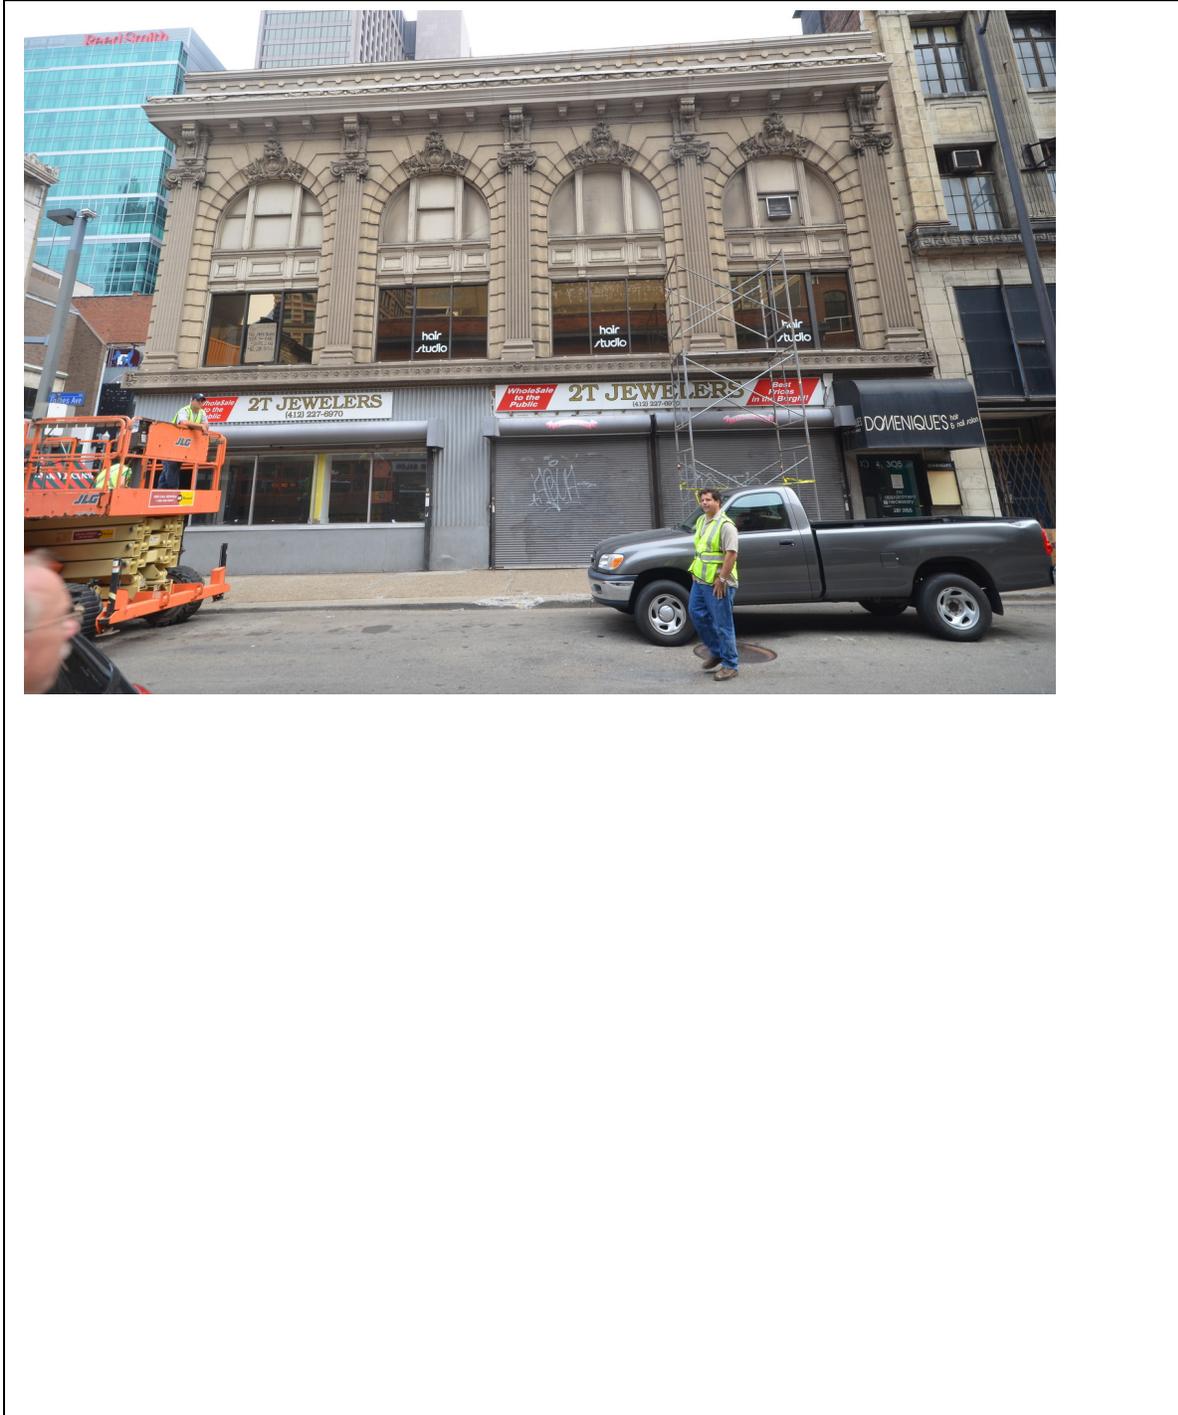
Dimling-Bolan Building (left), Ellis Billiards Building (right) Wood Street facade. (All digital photographs by Charles Uhl, November 2011.)
